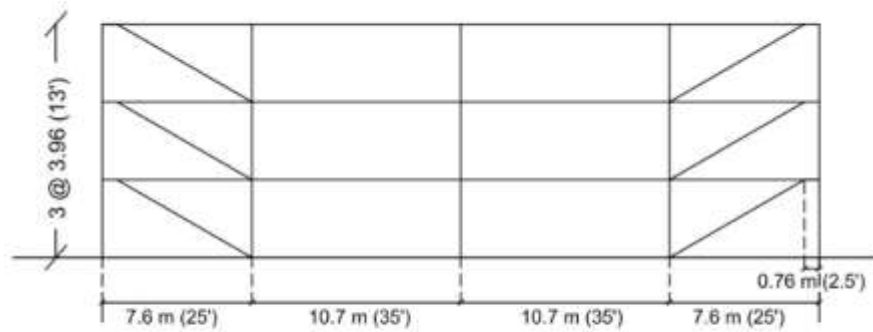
Elevation view of prototype SCEBF-D type buildings
